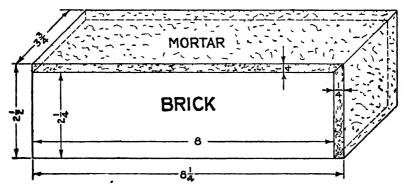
,634 —Unit stretcher brick with 1/4 in mortar joint
